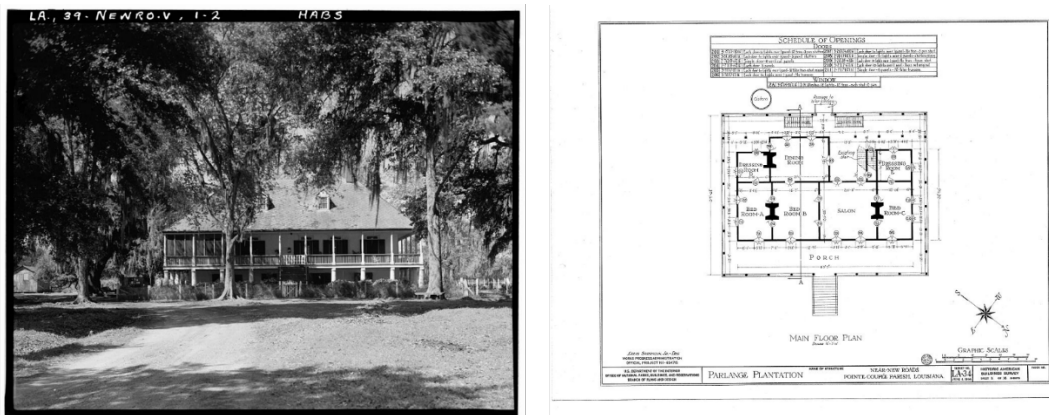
& 6. Front and Main Floor Floor Plan of Parlange Plantation House, courtesy of HABS
